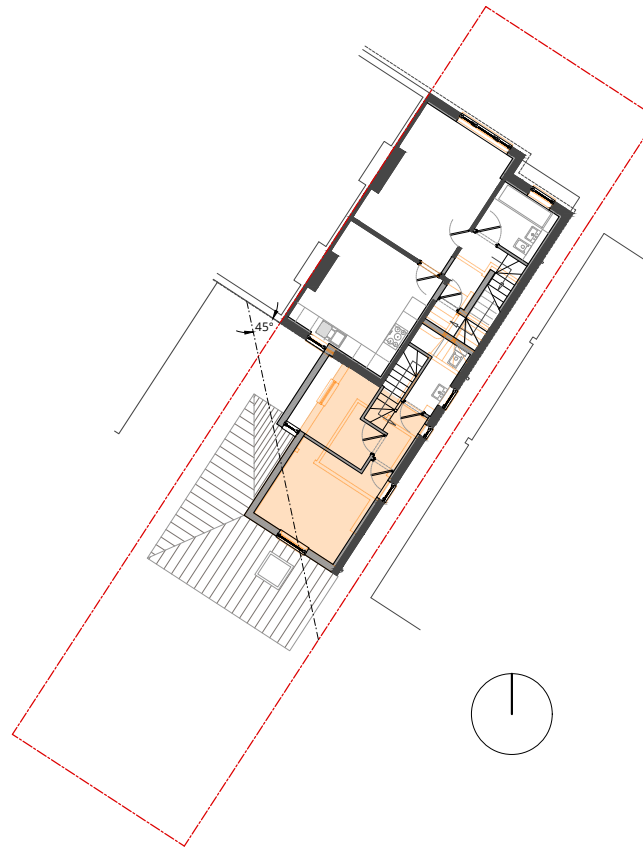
First floor plan showing the 45 degree line from adjoining neighbour at No.59 (ground floor window), highlighting how the proposed minor widening of the first floor is within this, and due to the orientation, have very little impact on the neighbour for most of the afternoon based on the existing rear projection at this level.
